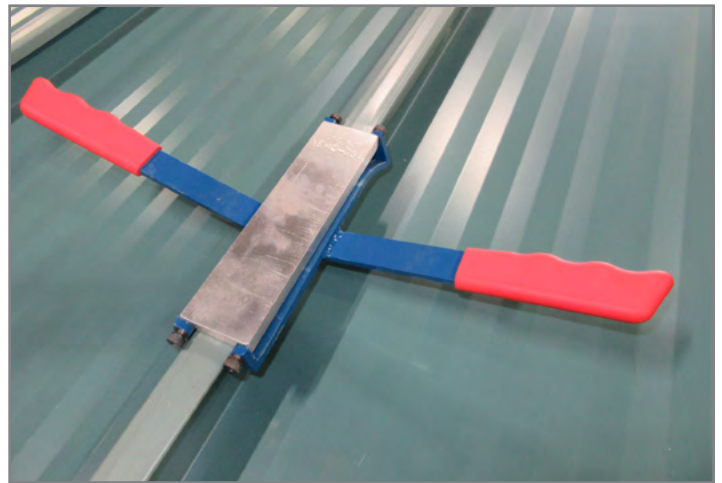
HAND SEAMING TEE-LOCK SIDELAP TO PROVIDE A STARTING POINT FOR SEAMING MACHINE
